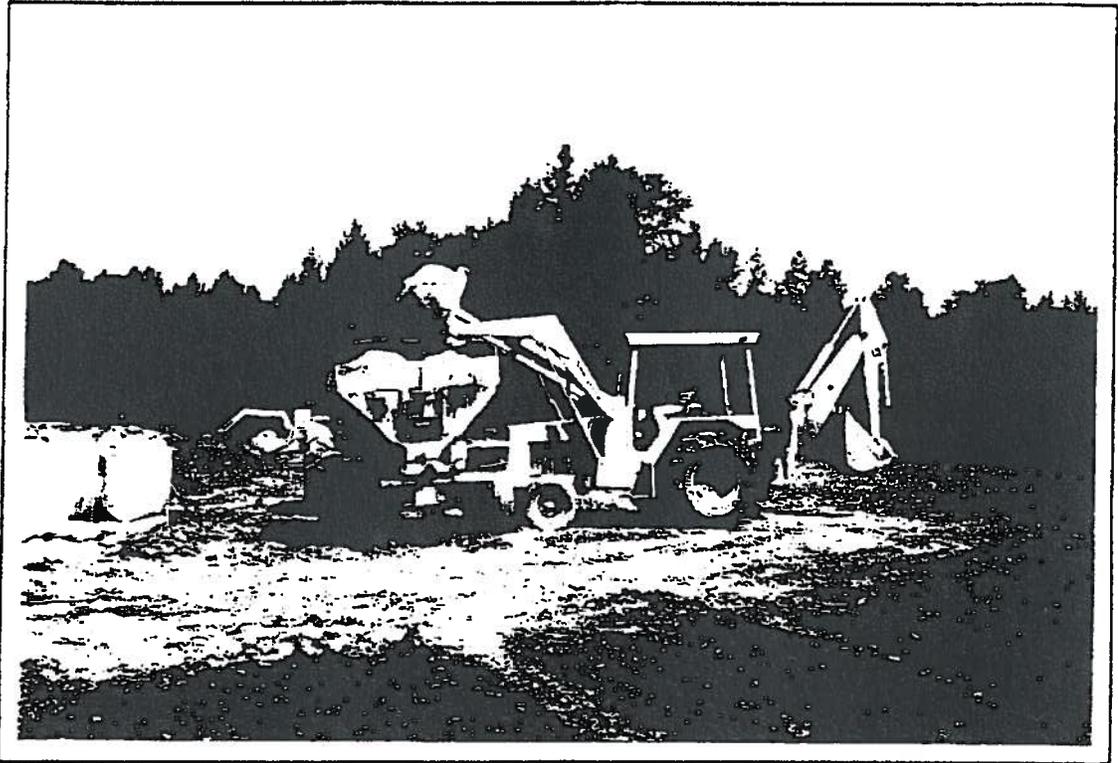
Loading Bentonite into the Spreader with the Backhoe
